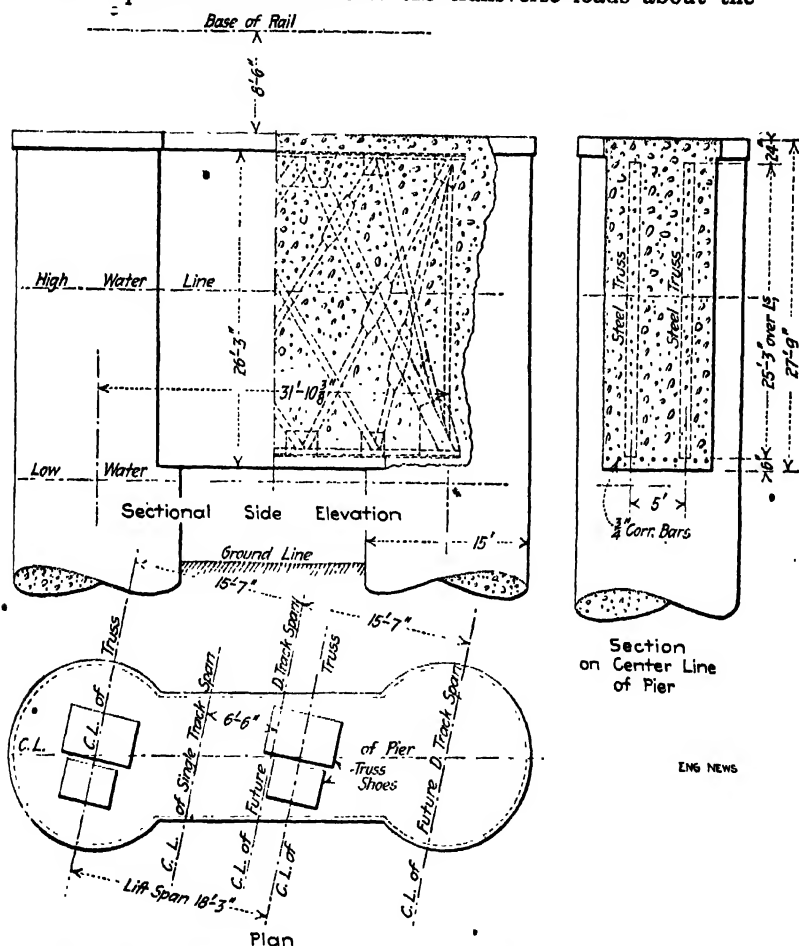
Cylinder Piers Braced by a Truss Encased in Reinforced Concrete.
